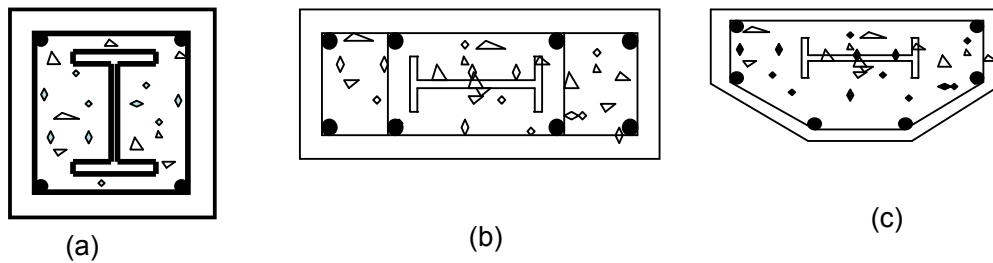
Shapes of Composite Column (a) Square Column (b) Deep Reinforced Column (c) Modified Shape for Exterior Column
